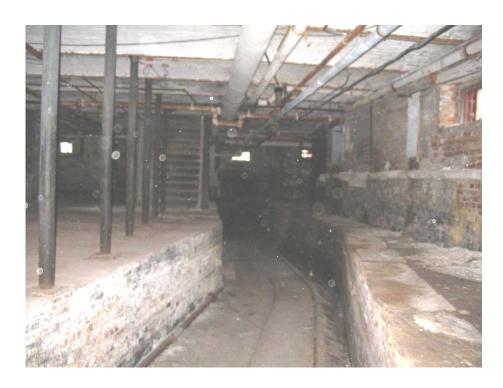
General view looking west toward east portal in basement of Building 31, Atkins Hall
